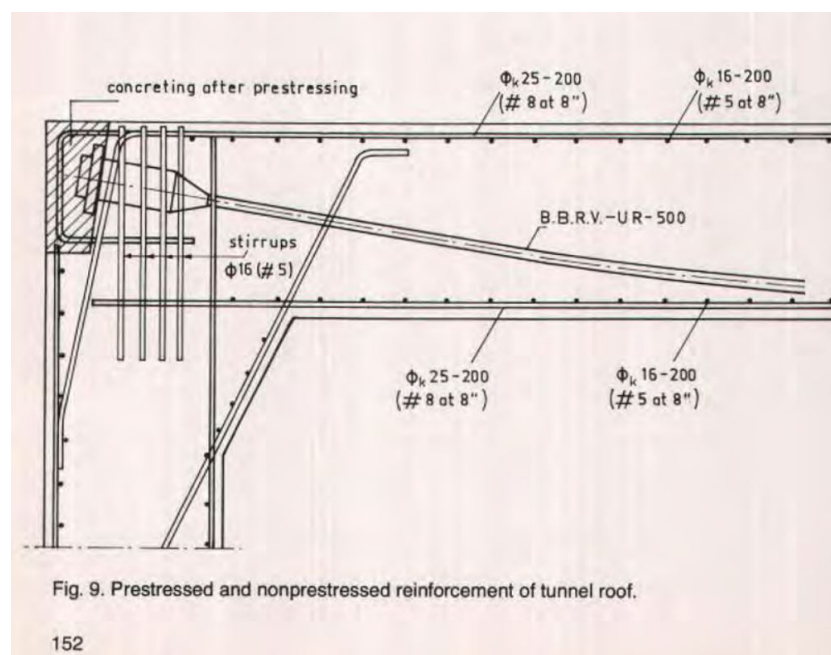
Prestressed and nonprestressed reinforcement of tunnel roof.
